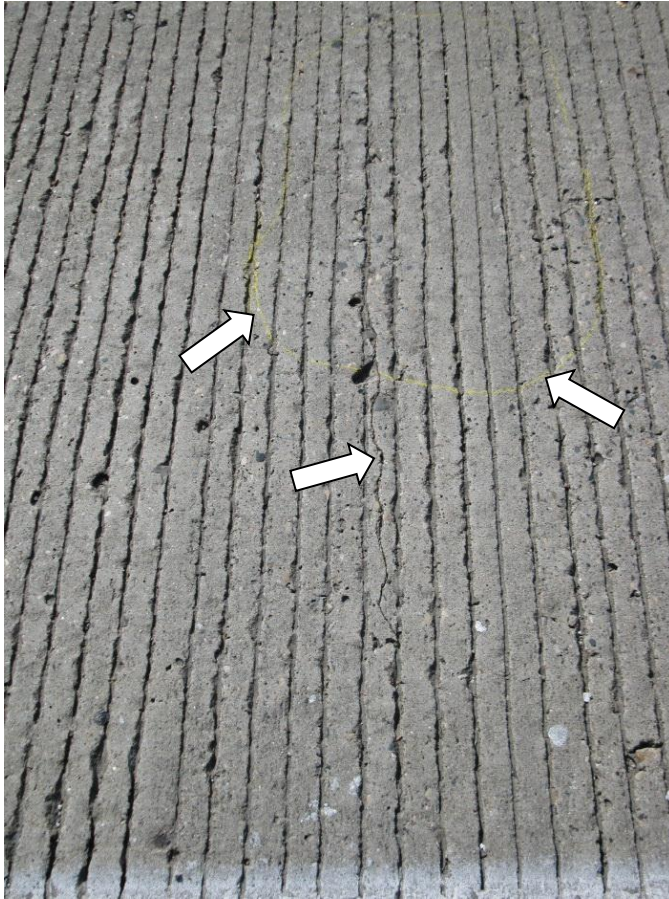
Typical transverse crack in east approach spans of US 30 bridge deck. Note delamination outlined in yellow (see arrows)
